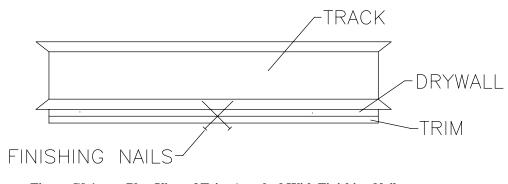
Plan View of Trim Attached With Finishing Nails
